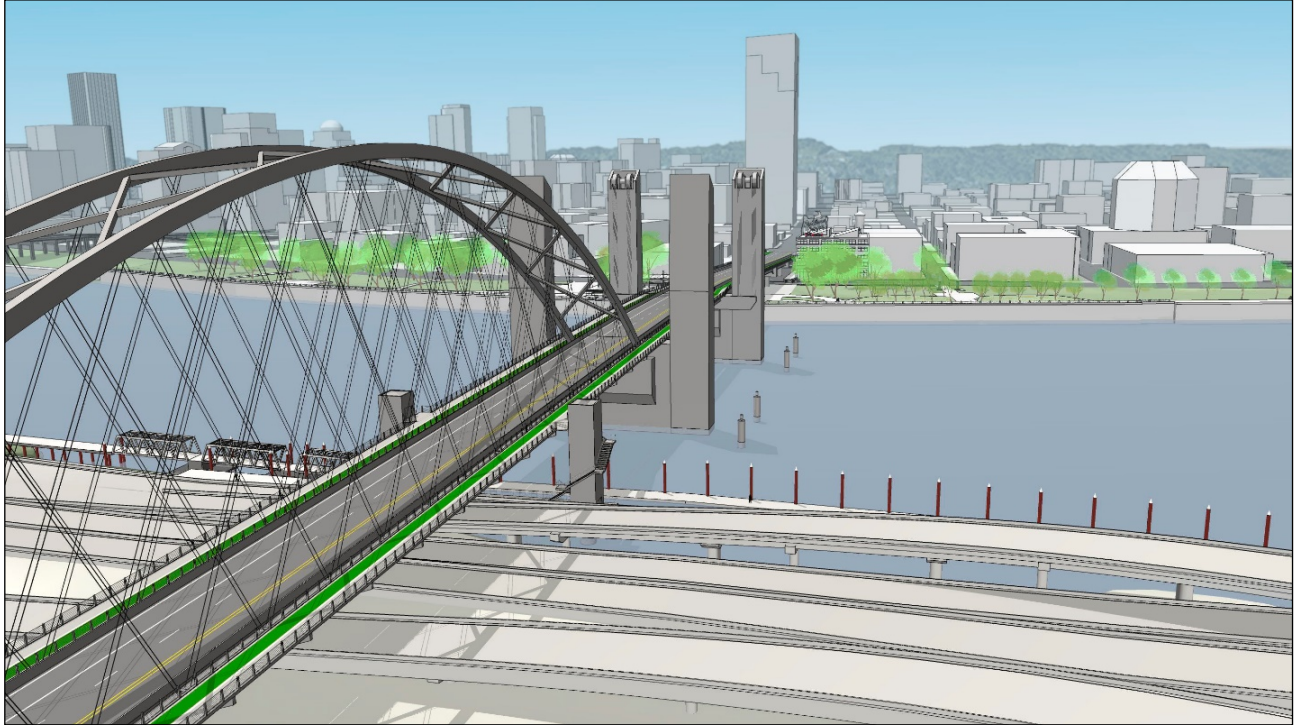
Span Combination 2 (girder west approach, vertical lift central span, tied arch east approach), artist's rendering, view looking southwest (Fat Pencil Studio, 2021).
